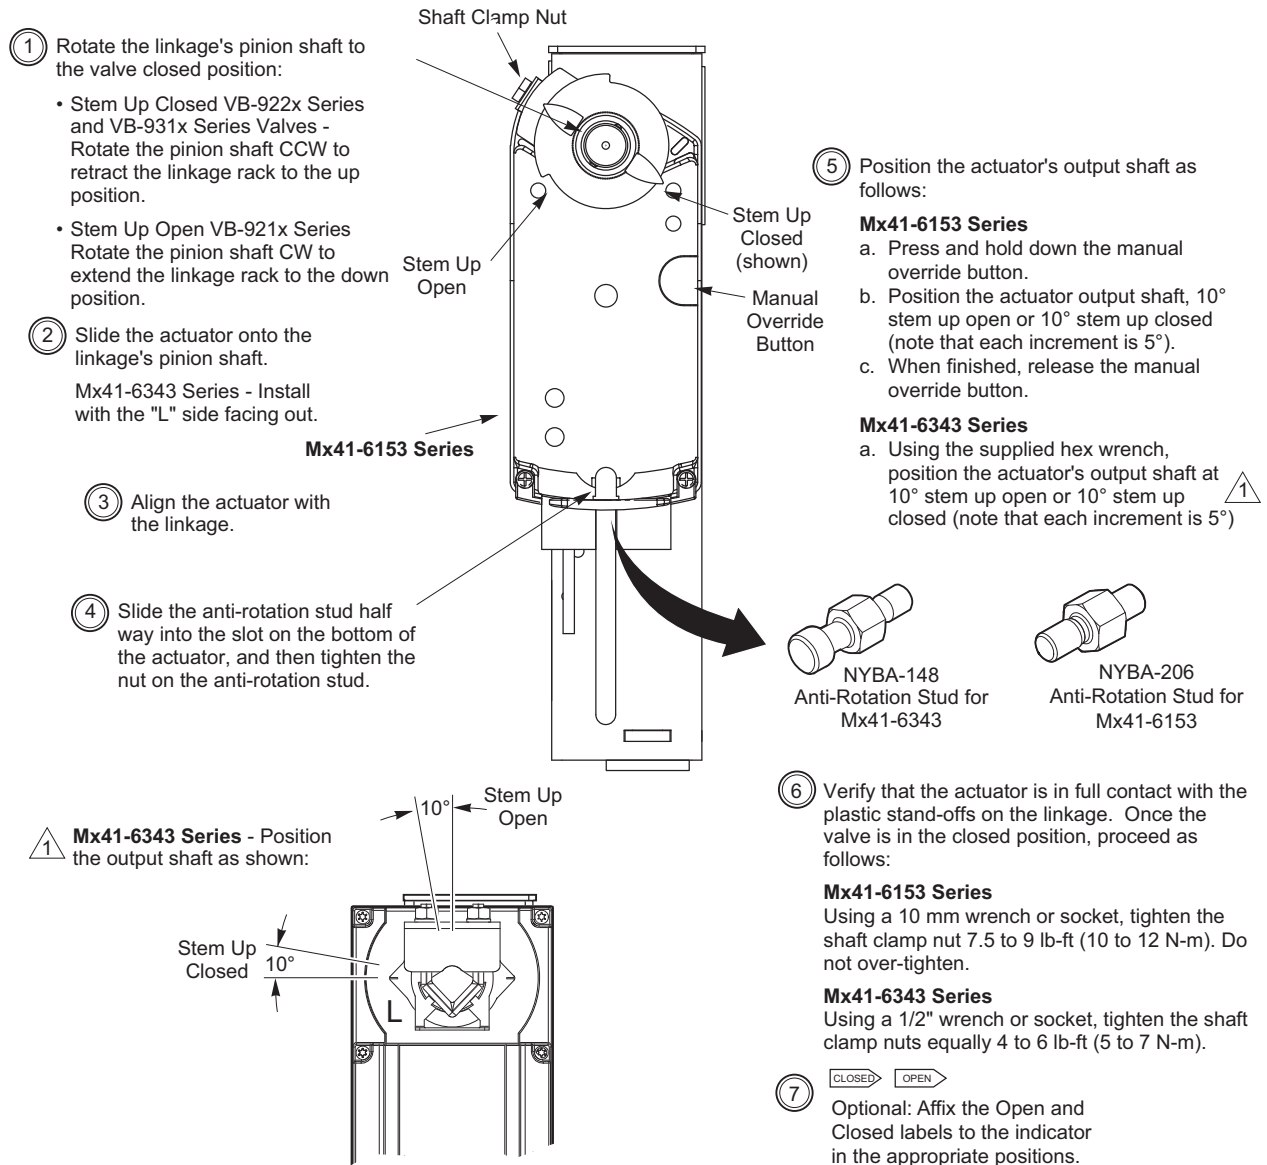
Mounting Mx41-6153 Series or Mx41-634x Series Actuators and Setting Up Actuator/Linkage Valve Assembly
